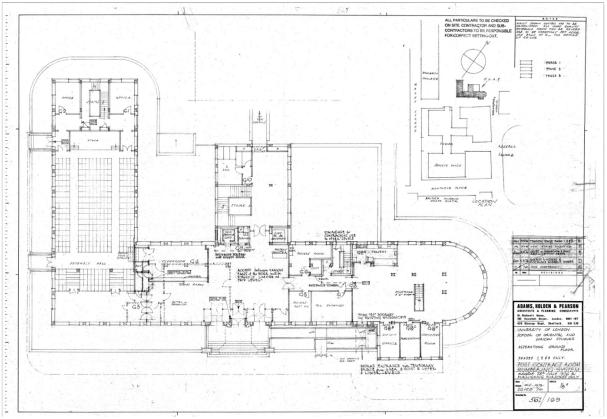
Adams, Holden & Pearson – Architects & Planning Consultants – Alterations Ground Floor (Adams Holden & Pearson: 1974)
